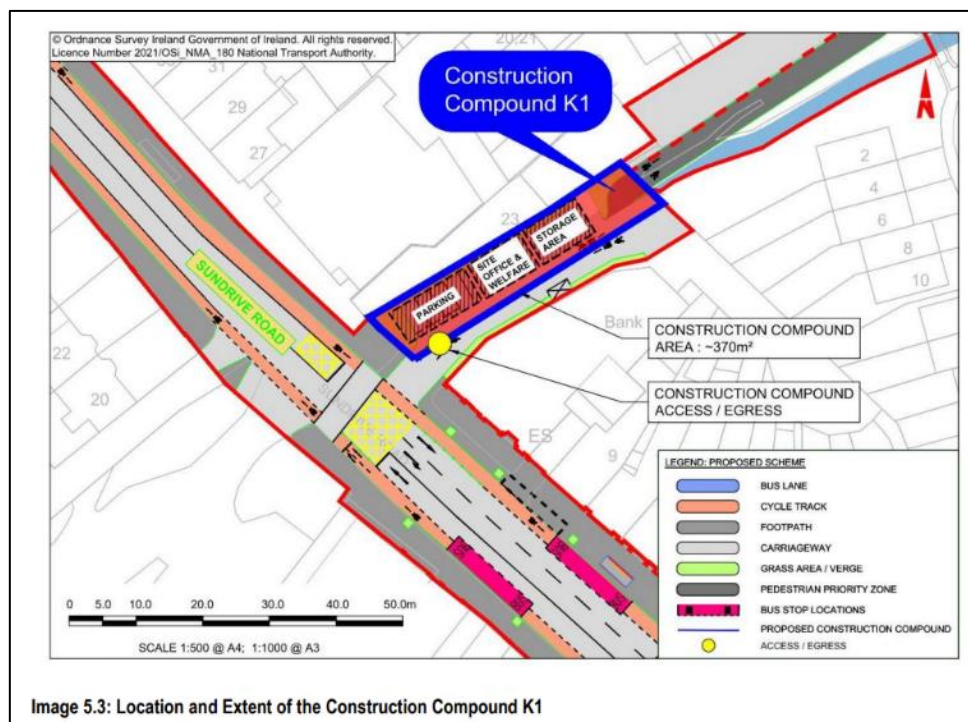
Construction Compound K1 at Sundrive Road
